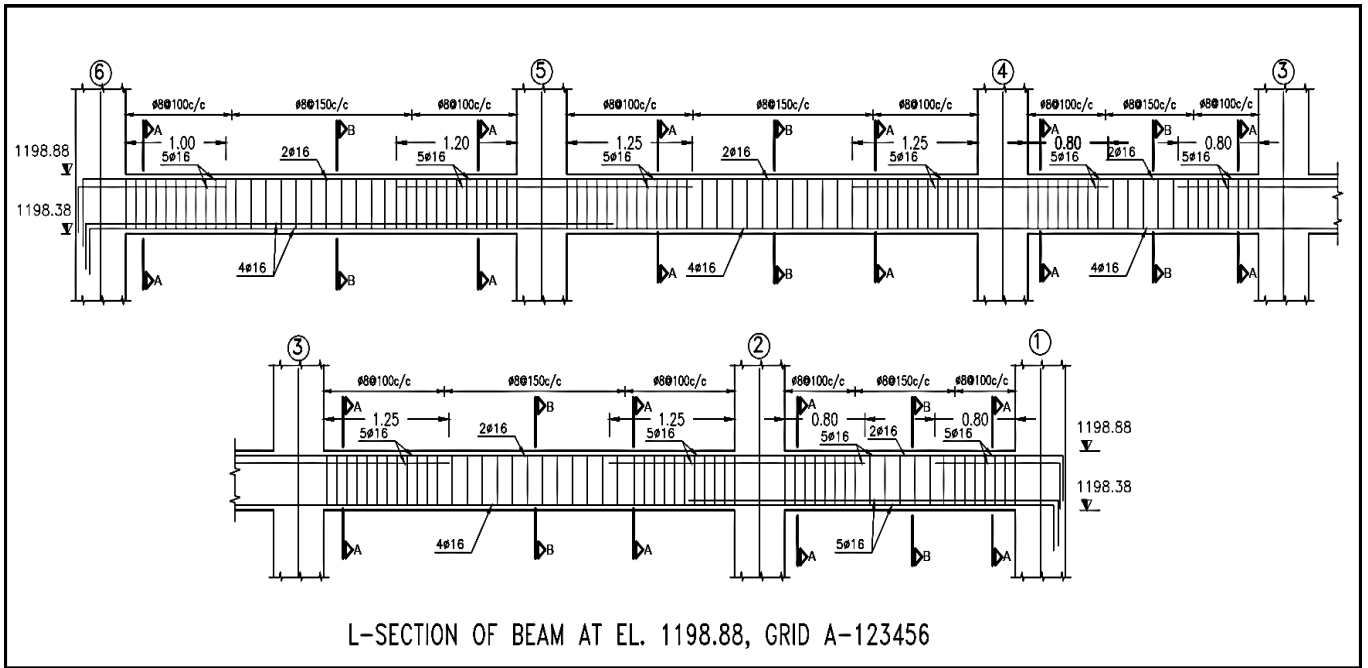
38 Longitudinal section of beam at Grid A with reinforcement detail
